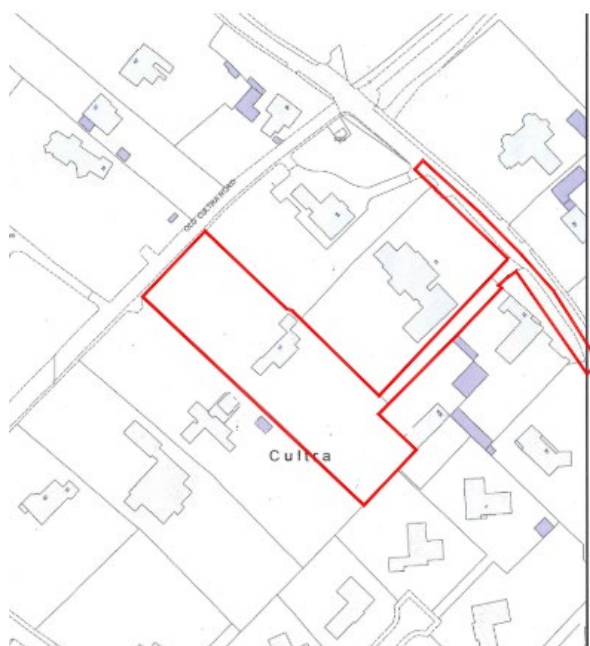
Site Location Plan (Extract DRG LA06/2024/0222 01)
